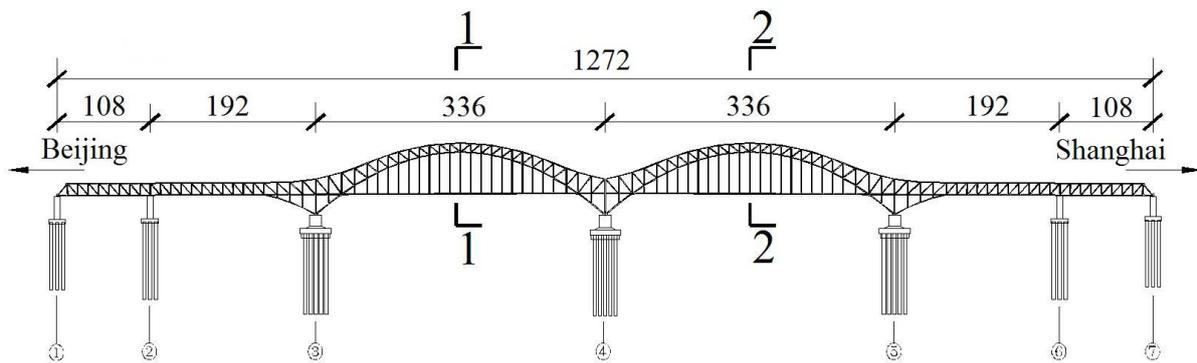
The side elevation drawing of the bridge (Unit: m)
